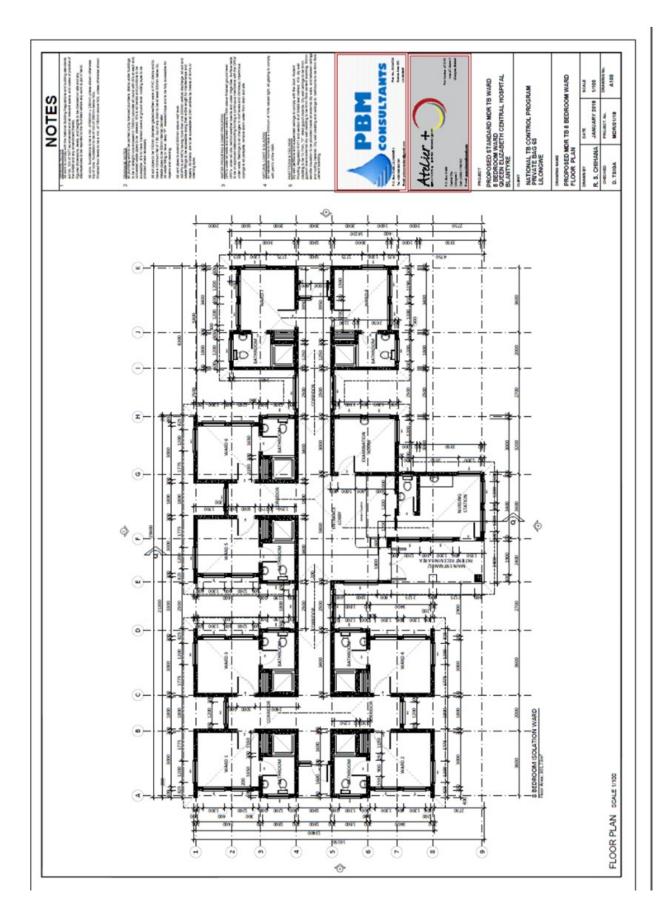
Site plan of the proposed 4-roomed MDR-TB Isolation Wards
